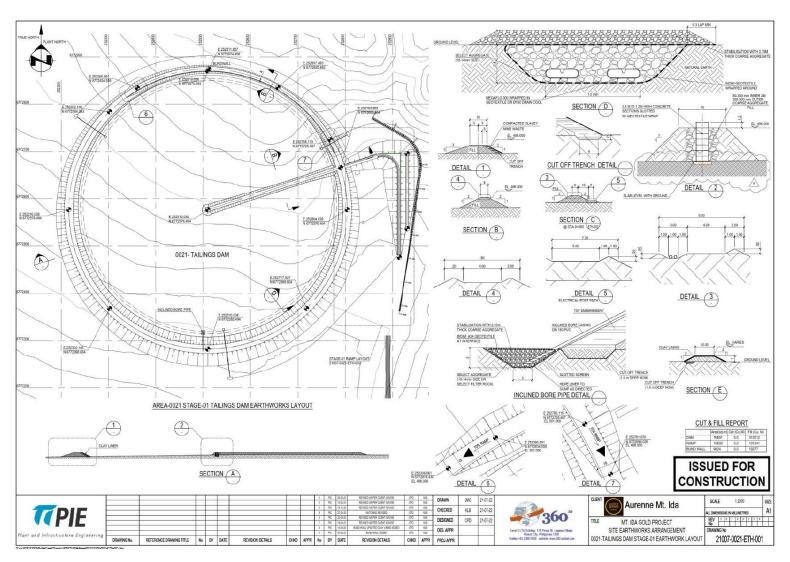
Integrated Waste Landform Tailings Storage Facility (IWL TSF) General Layout - Embankment St age 1
